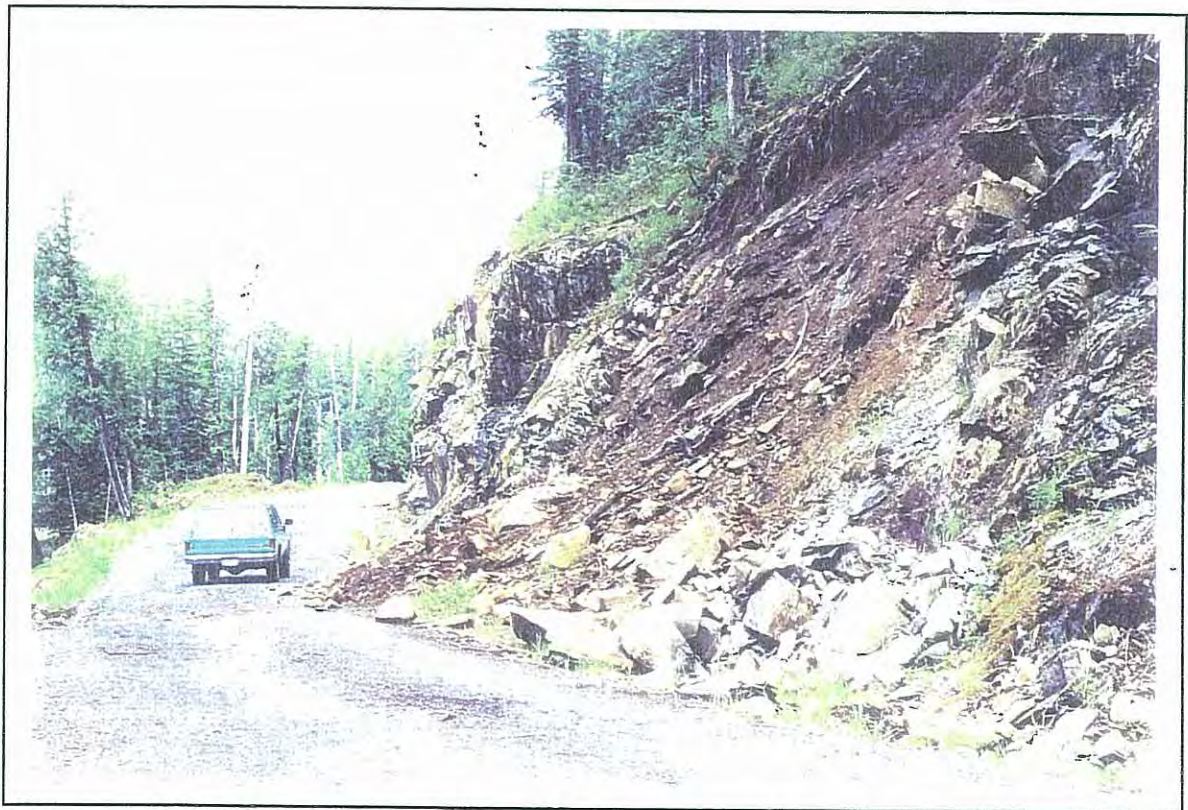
View back from Photo 2 showing rock slope failure on steeply inclined joint system. Overburden is about one meter thick.
